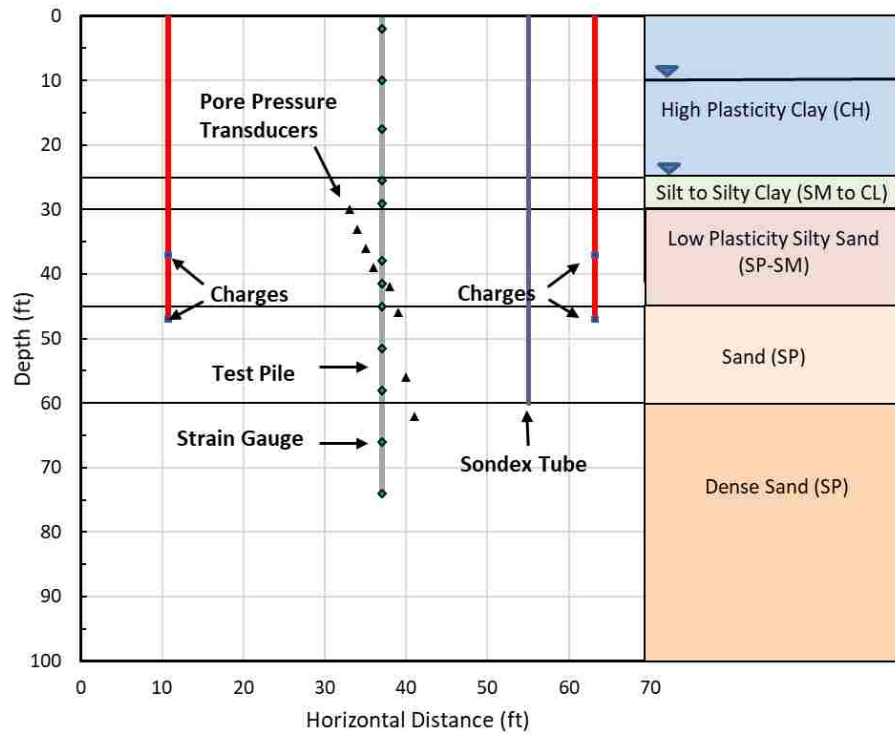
Profile drawing of test pile, blast holes, and instrumentation for a typical test pile/drilled shaft at the test site.
